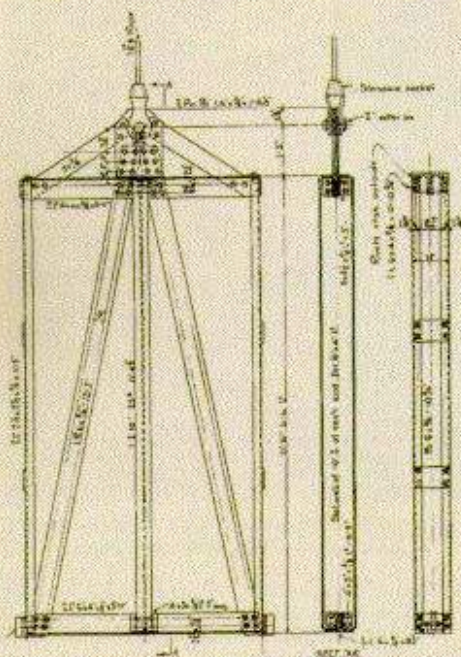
Detail of 10-ton Weight Box for Track Cable.
